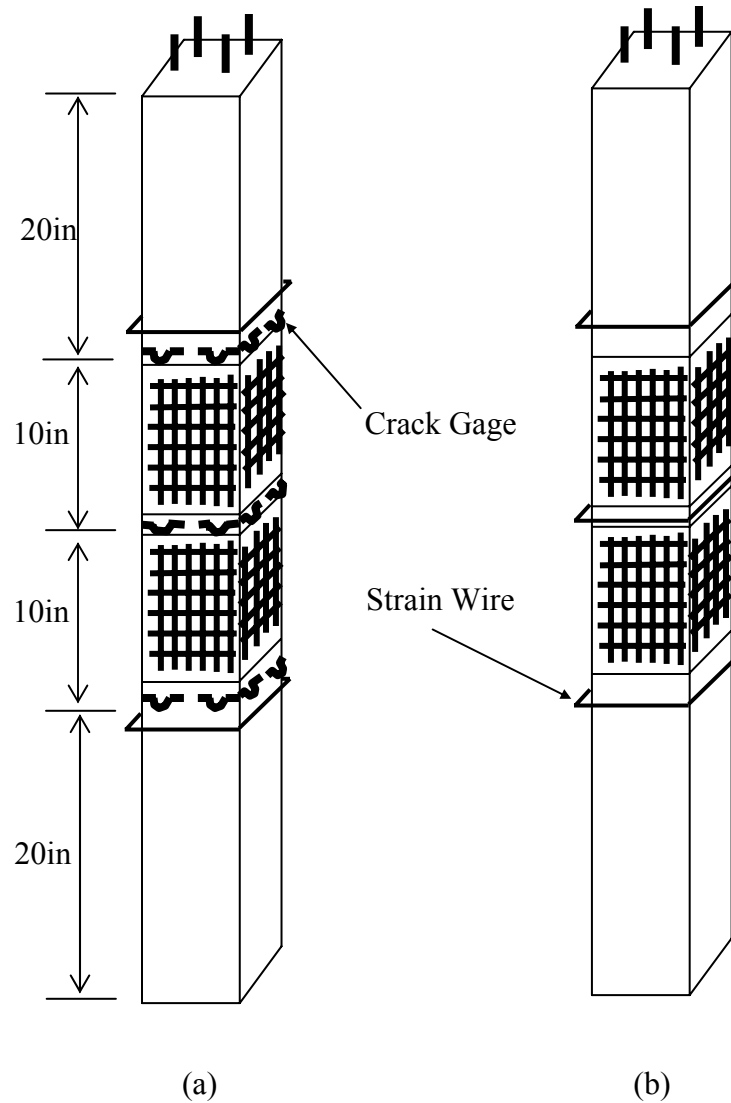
Schematic Drawing of (a)#7 and #8 Specimens; (b)#5 and #6 Specimens
